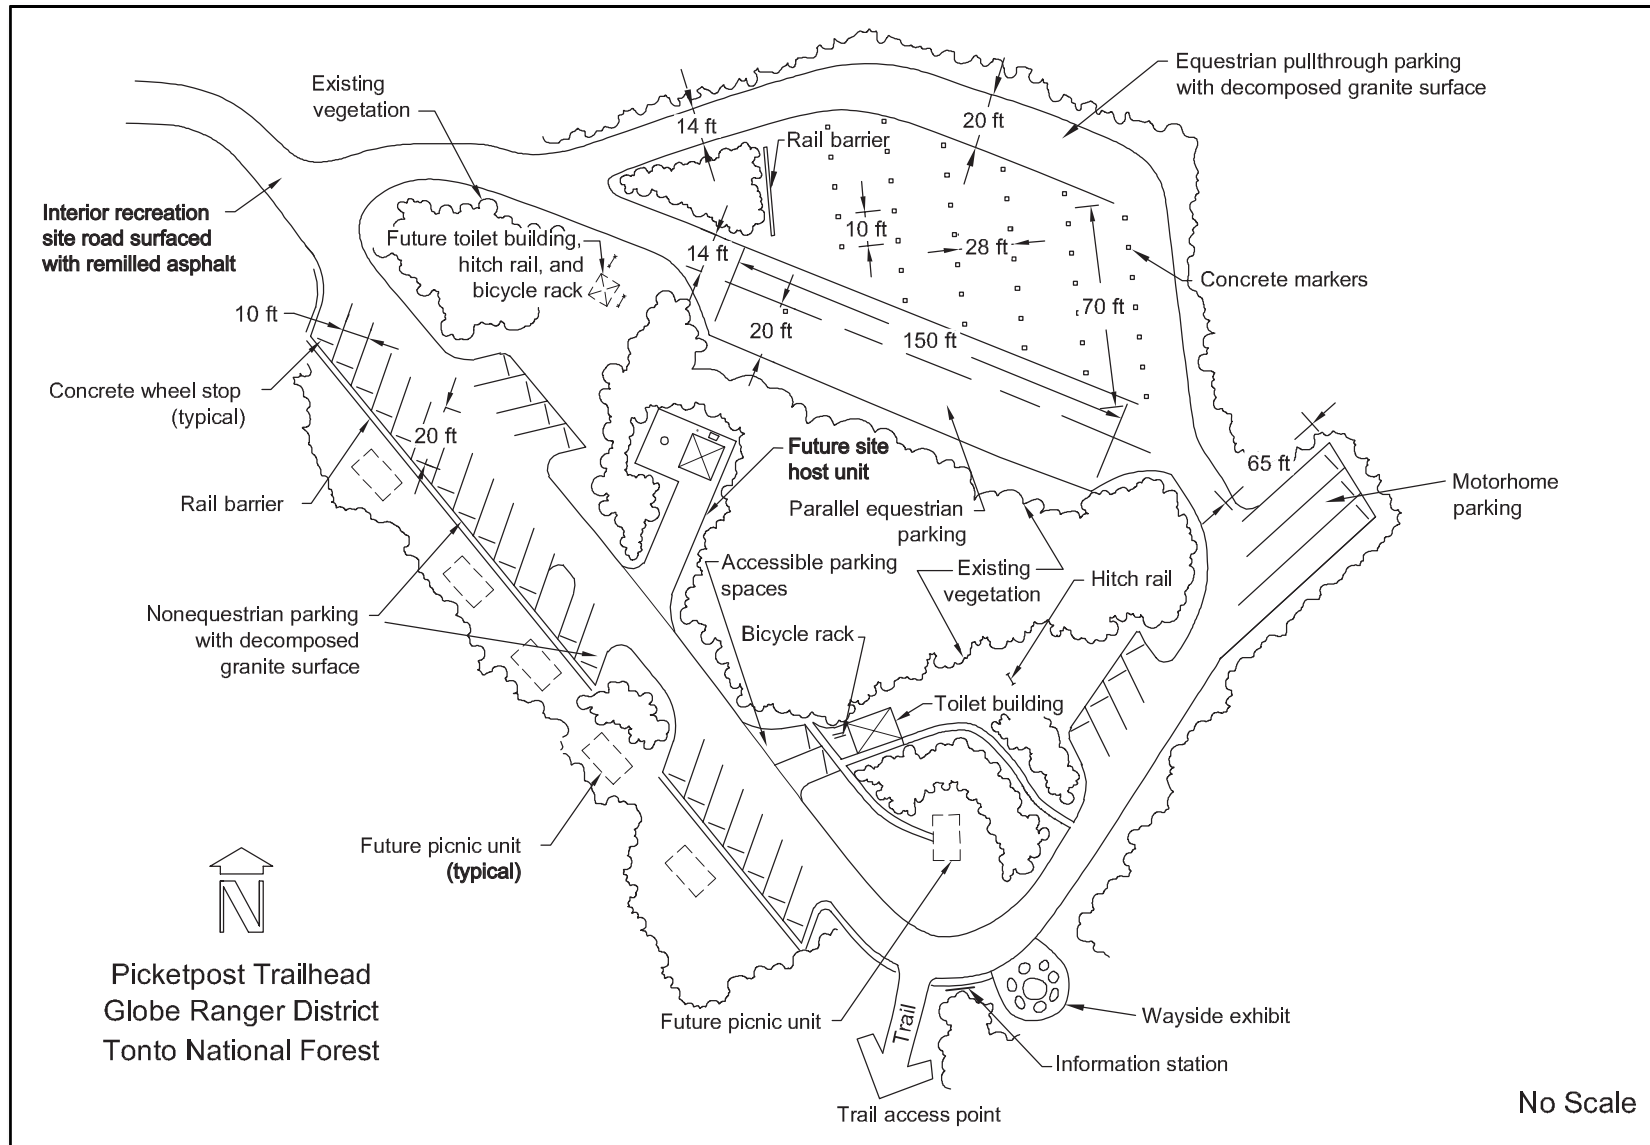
Picketpost Trailhead in the Tonto National Forest. Future plans include construction of a site host unit, picnic units, and another toilet building.
